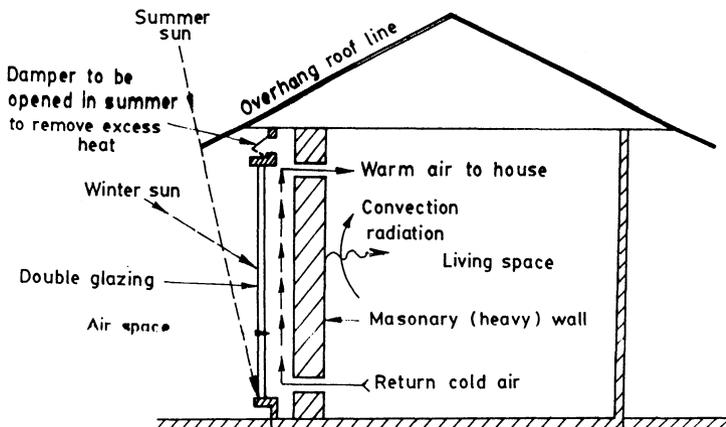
TROMBE WALL OR THERMAL MASS WALL
